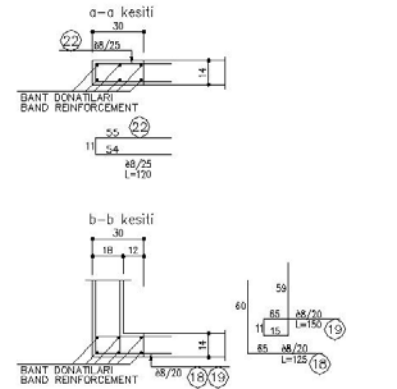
Strip Reinforcement for Section a-a of Figure 14
